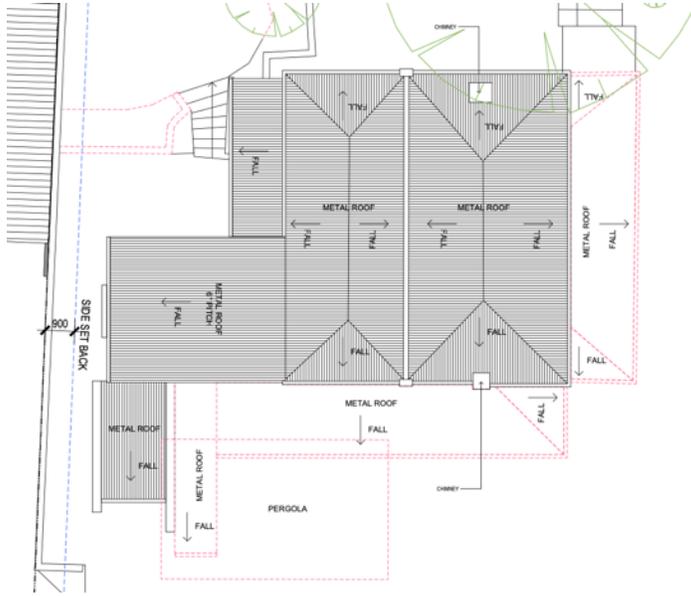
, Existing Roof Plan, *Michael Cumming Architect*, 12.08.22
